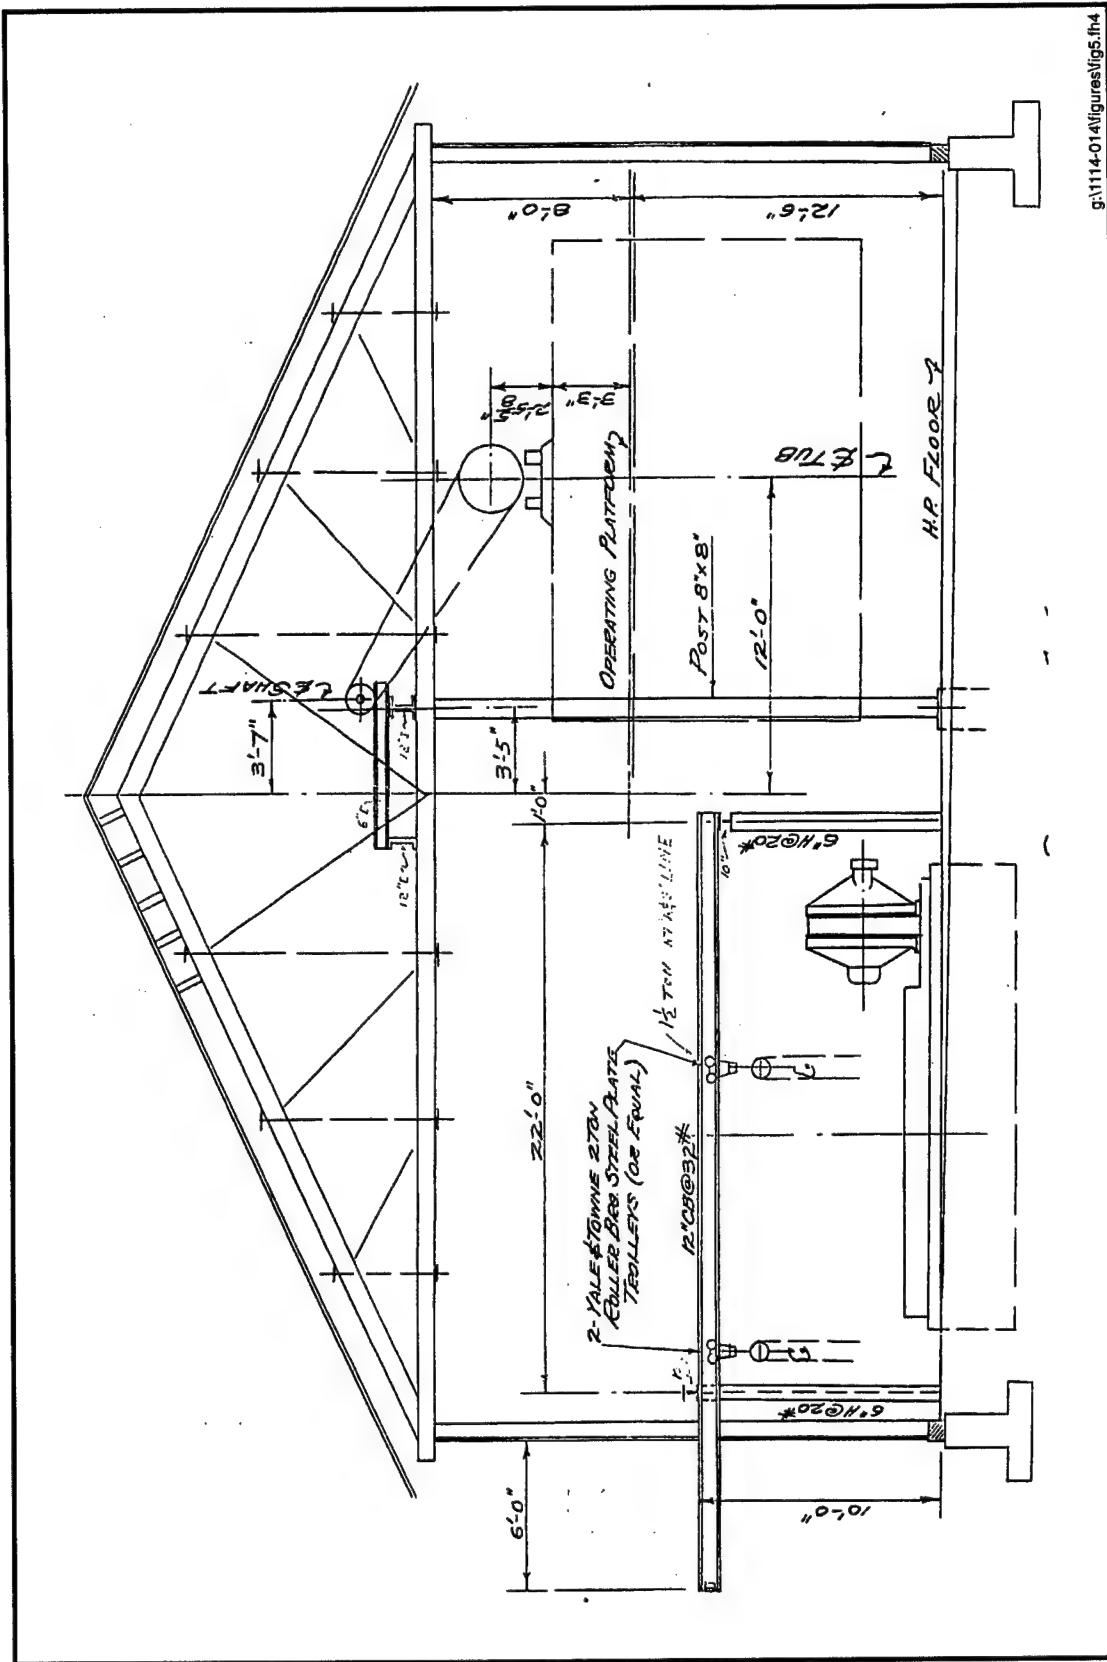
Interior elevation of Building 1022, the Beater House, where cotton was ground (1940 HPC Drawing #6929-257).
